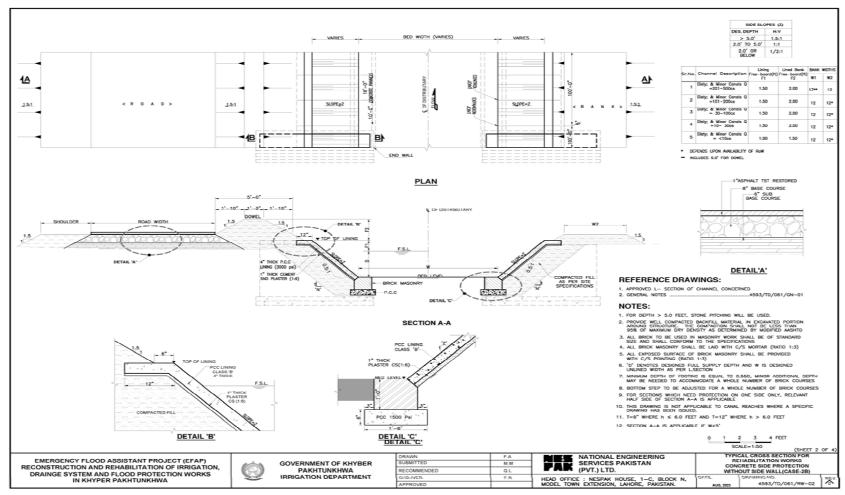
Typical Cross section for Rehabilitation work concrete side protection
